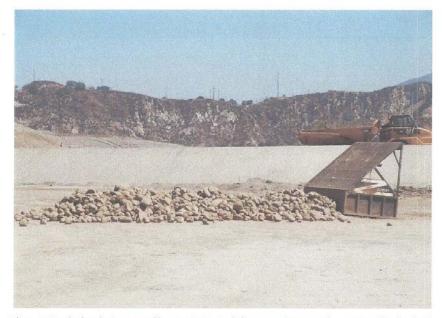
Rocks for drain tower filter at Basin A – leftover sediment to be removed in the back
